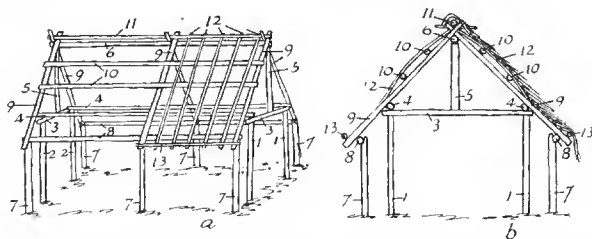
Rectangular section of cooking house (*utupoto* type): a, side view; b, end view: 1, 2, supporting posts (*pou tu*); 3, transverse tie beams; 4, longitudinal tie beam purlin; 5, king posts; 6, ridgepole; 7, wall posts 26 inches from supporting posts; 8, wall plates; 9, rafters; 10, purlins; 11, upper ridgepole; 12, thatch rafters 12-15 inches apart; 13, eave batten.
